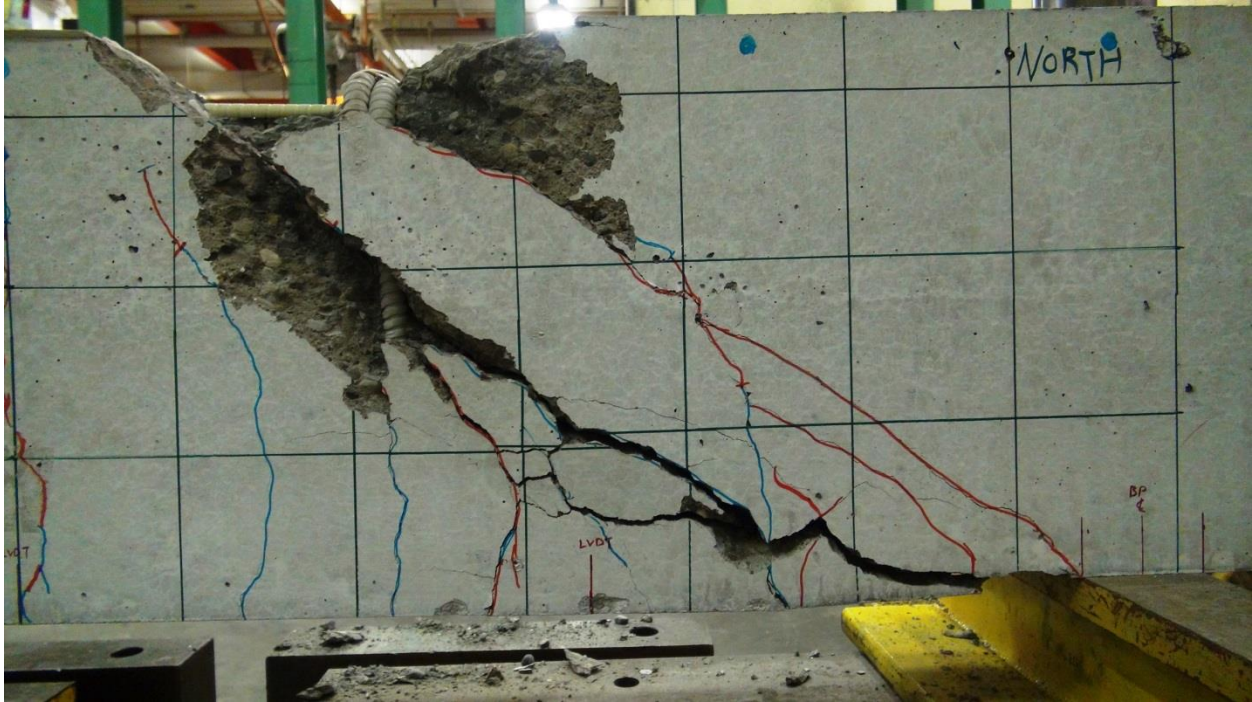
BM16-220 Alternative Photo of Entire Beam Under Load After Testing
